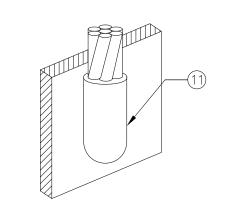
H — VERTICAL WIRE TAP TO A VERTICAL STEEL SURFACE.
